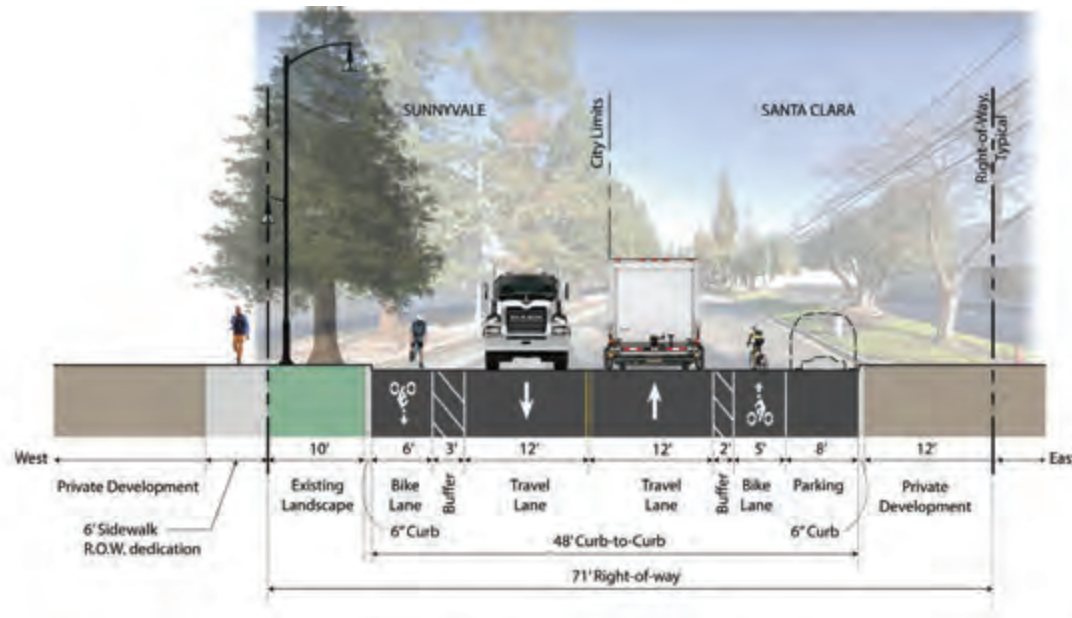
Kifer Road and Uranium Drive Plan
